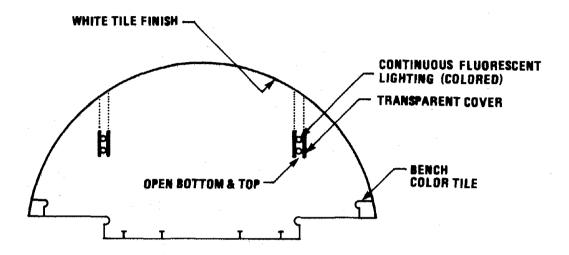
STATION ILLUMINATION - PARIS METRO
